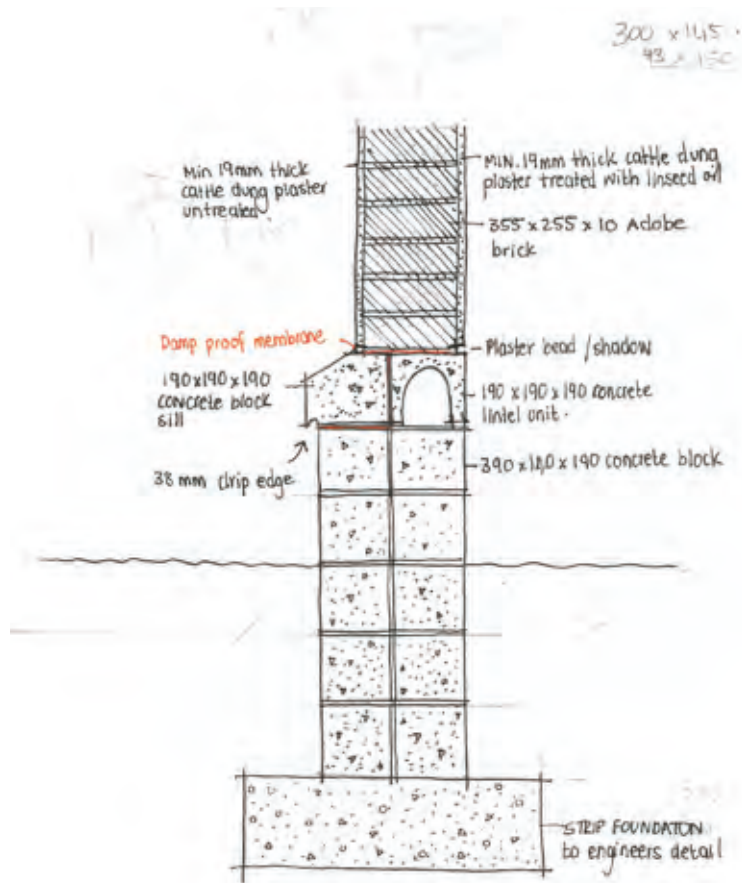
Detail depicting foundation, concrete masonry and adobe wall connection (Van Staden 2021).
